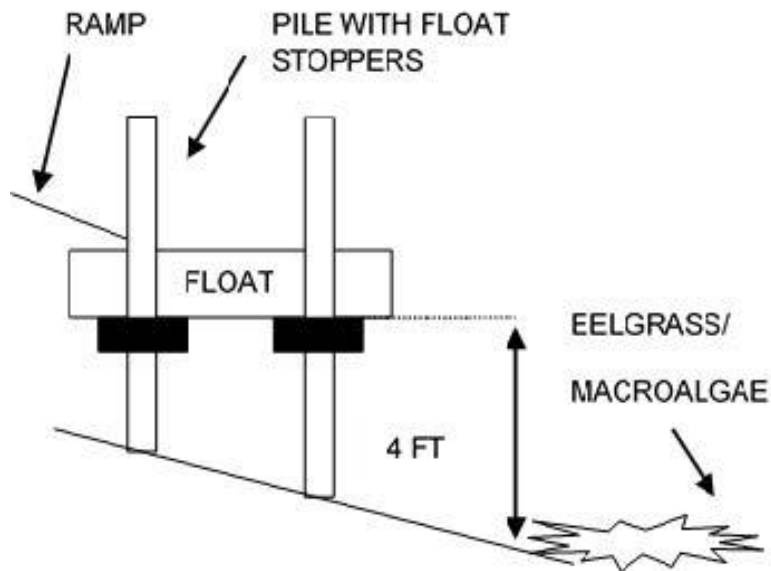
Proposed Float within 25 feet of SAV. Side-view. The bottom side of the float must be elevated at least 4 feet above the substrate at low tide.
